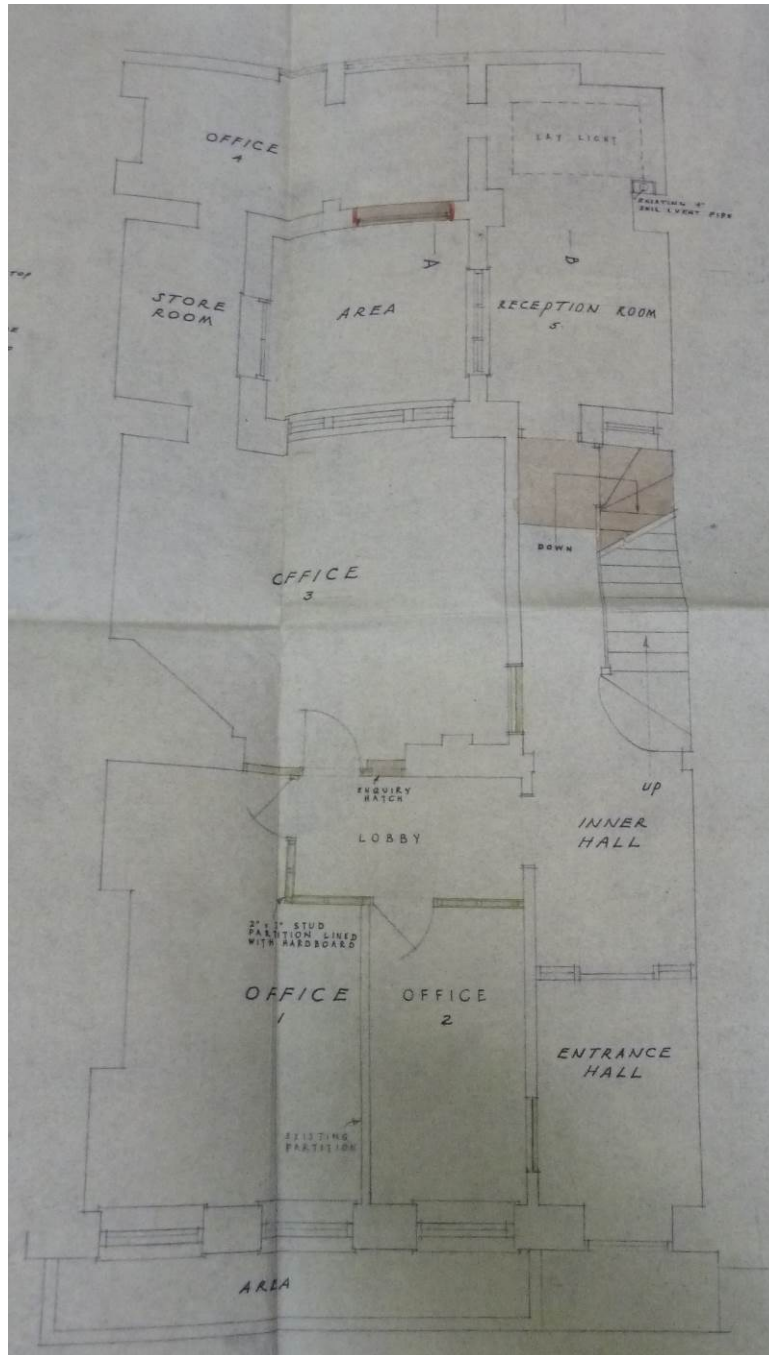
Ground floor plan, Lawrence Farman & Partners, 1956
